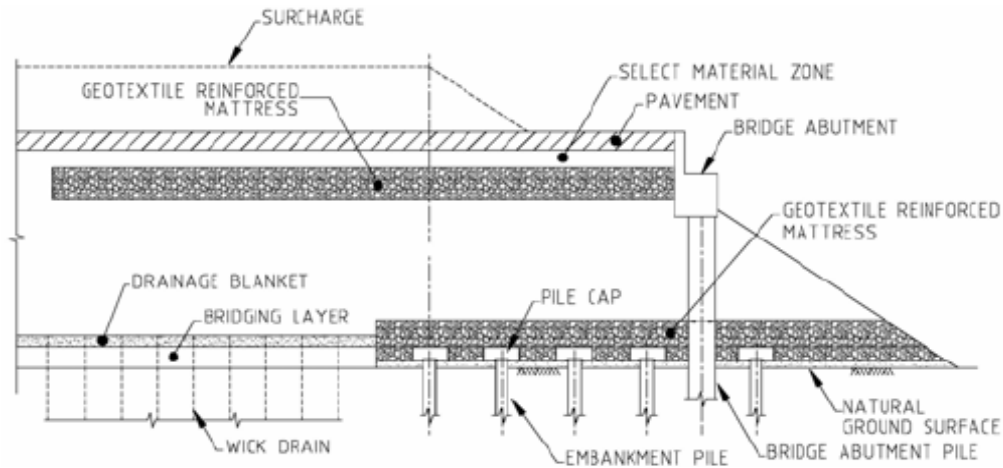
Schematic of Bridge Approach Embankment Supported on Driven Piles
